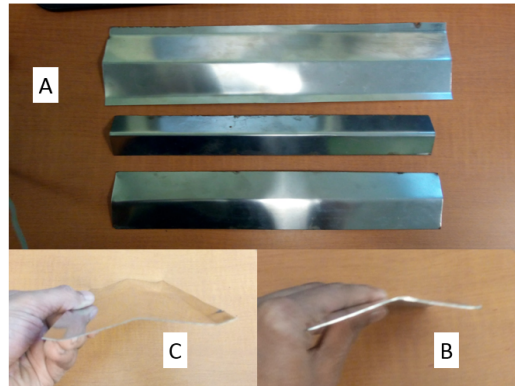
Specimen made to test buckling A.3 different cross section used for test. B. V type section. C. New section type
